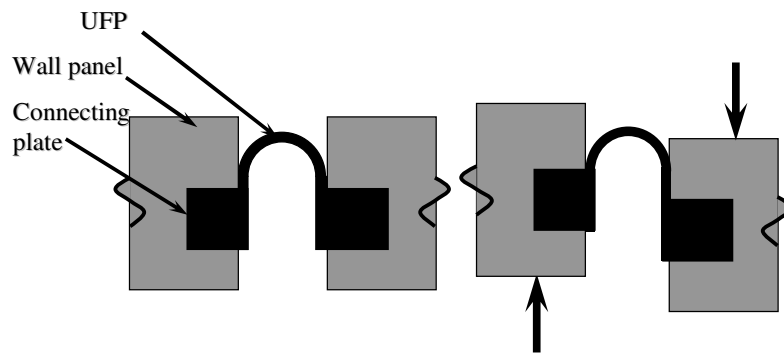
Arrangement and working mechanism of UFPs between walls
